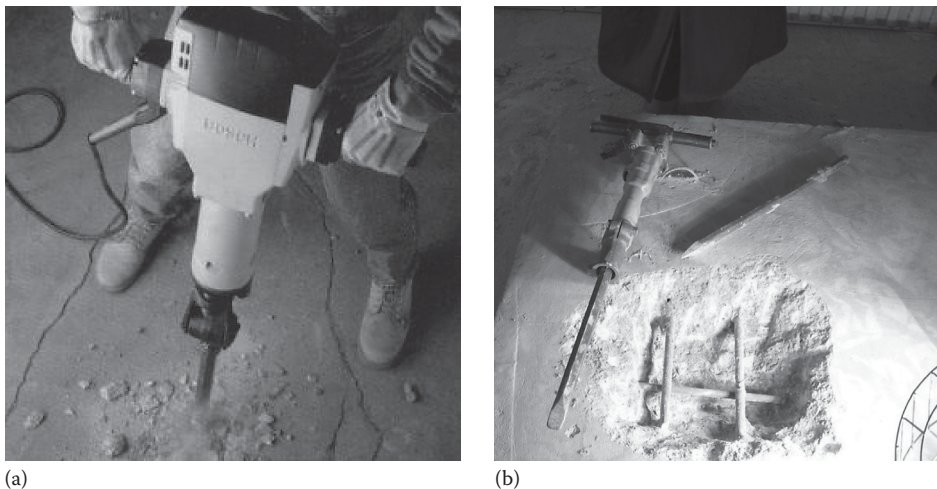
Jackhammer to expose the reinforcement. (a) Jackhammering. (b) Exposed reinforcement.
